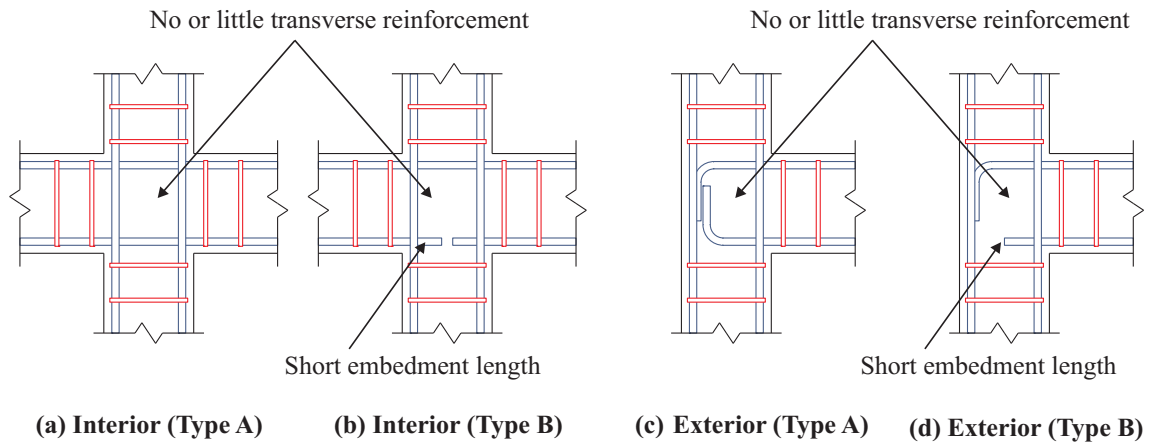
Typical reinforcing details in non-ductile beam-column joints
